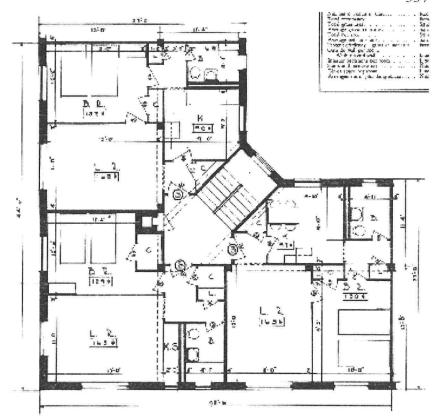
Ell plan *Unit Plans*, HD-26.
